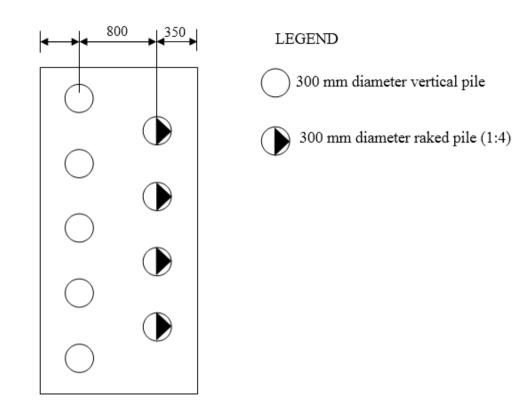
Pile arrangement for abutment (all dimensions in mm)
